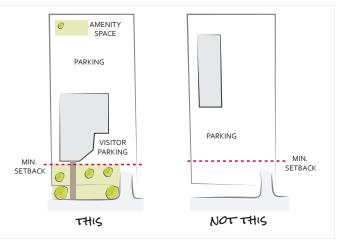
The preferred location for main parking areas is at the side and/or rear of the building (6.4.3 a). Provide landscaped amenity space and landscaping to soften the street edge.
